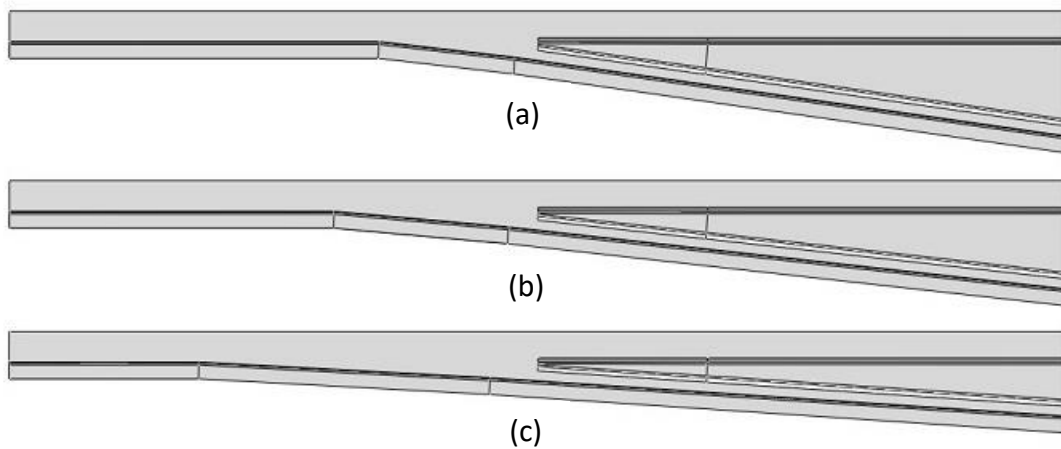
The 3 m-sections of crossing models with an angle of (a) 1:7, (b) 1:9, and (c) 1:15.
